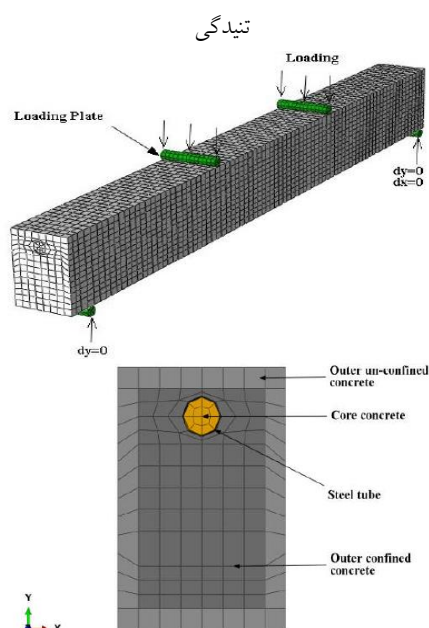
FE modelling of prestressed concrete-encased CFST beams
